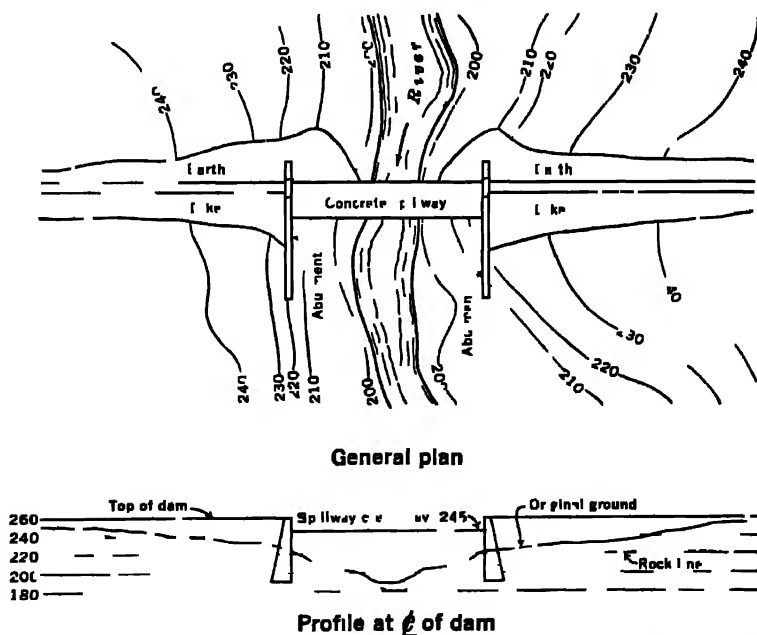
Diagrammatic example of earth dam with concrete spillway and abutments
